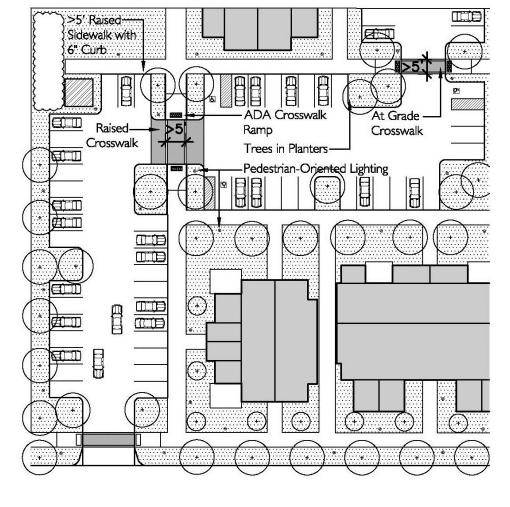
B.4. Dividing Parking Lots into Separate Areas
